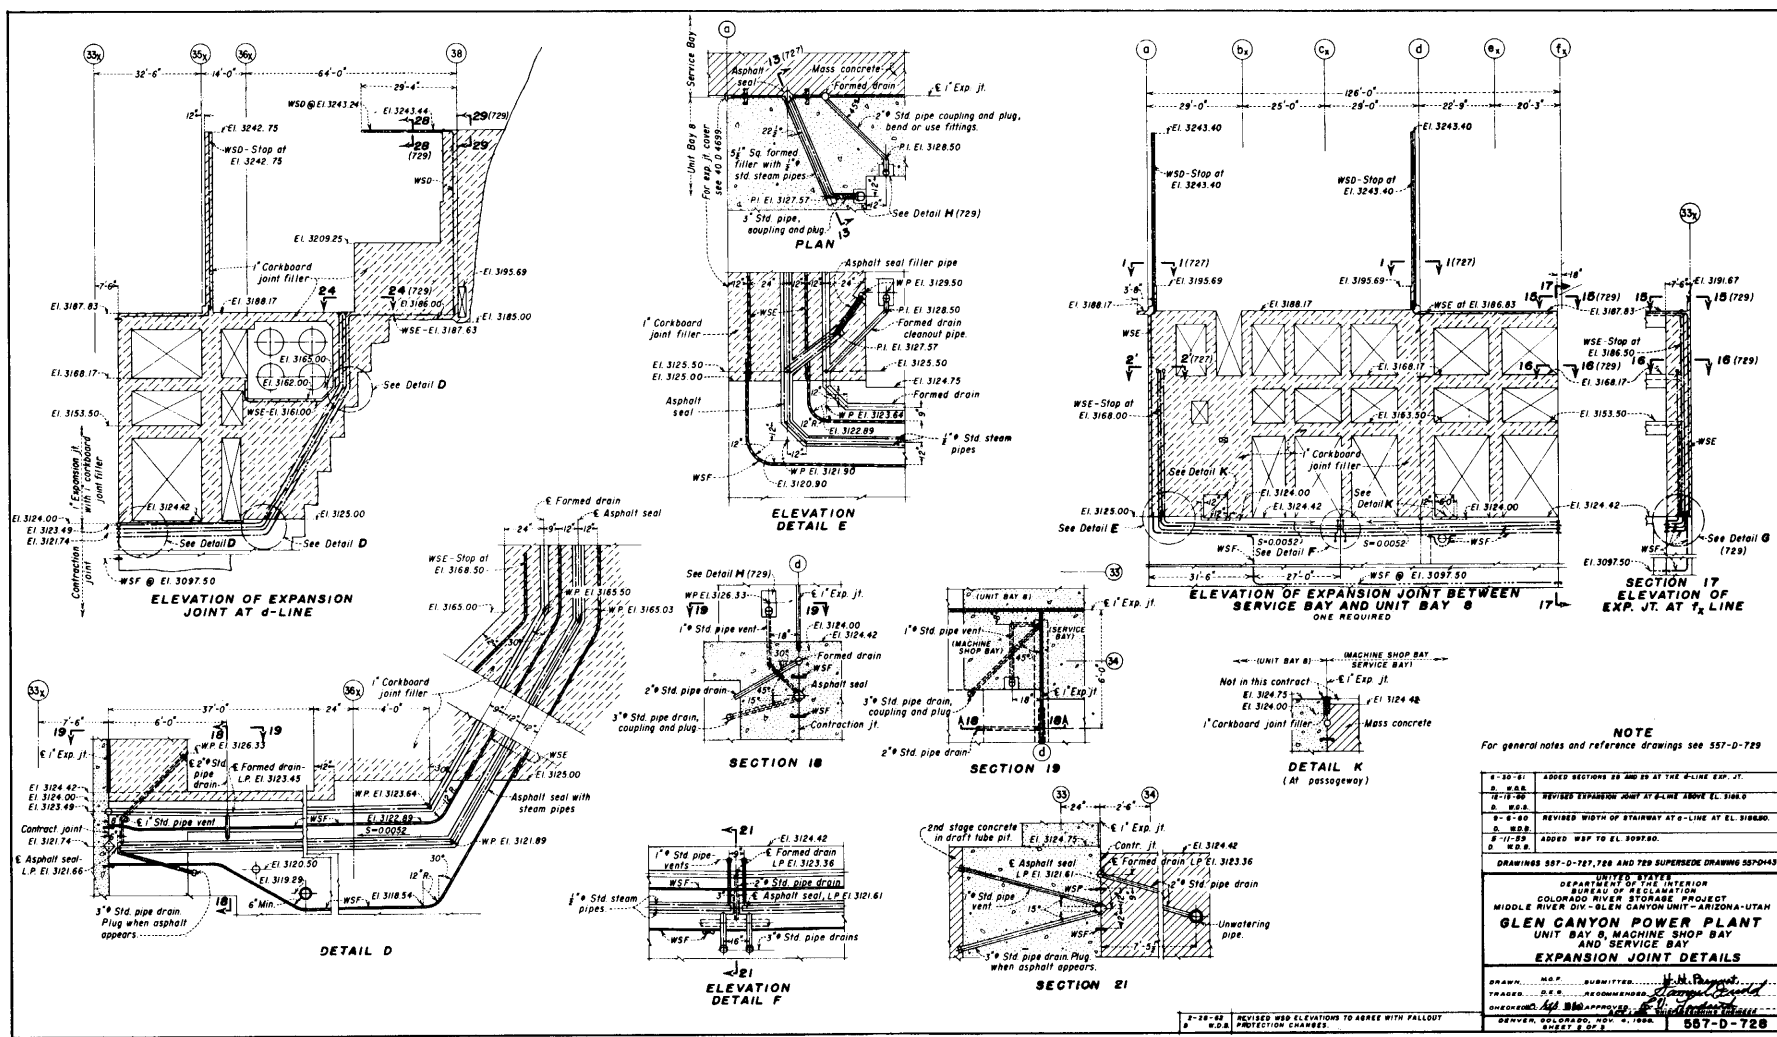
Powerplant expansion joint details—Unit bay 8, machine shop bay, and service bay. (Sheet 1 of 2.)
